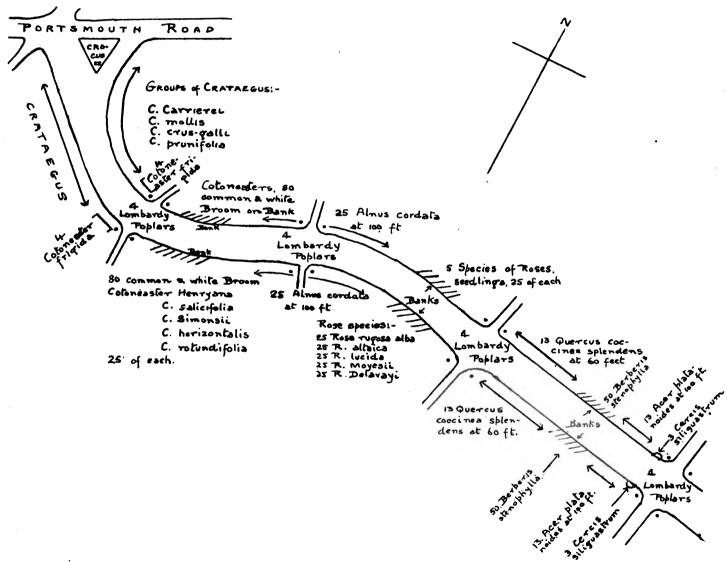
PLANTING PLAN FOR THE KINGSTON (SURREY) BY-PASS ROAD.
